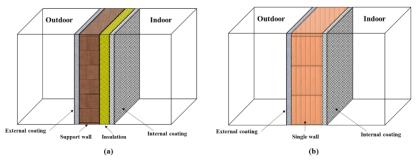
(a) Internal Thermal Insulation (ITI) and (b) Single-Wall Structure (SWS) layouts
